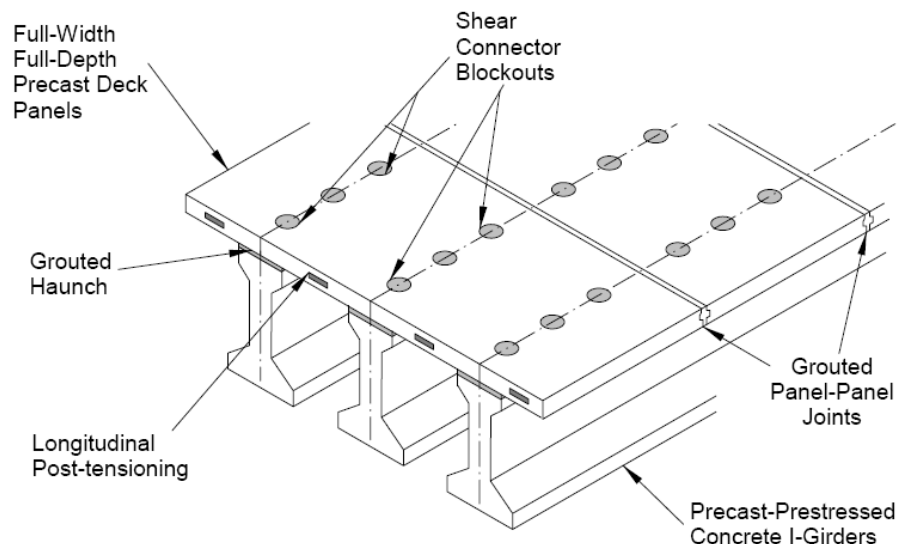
Precast Concrete Bridge Deck Panel System (Scholz, 2004).
